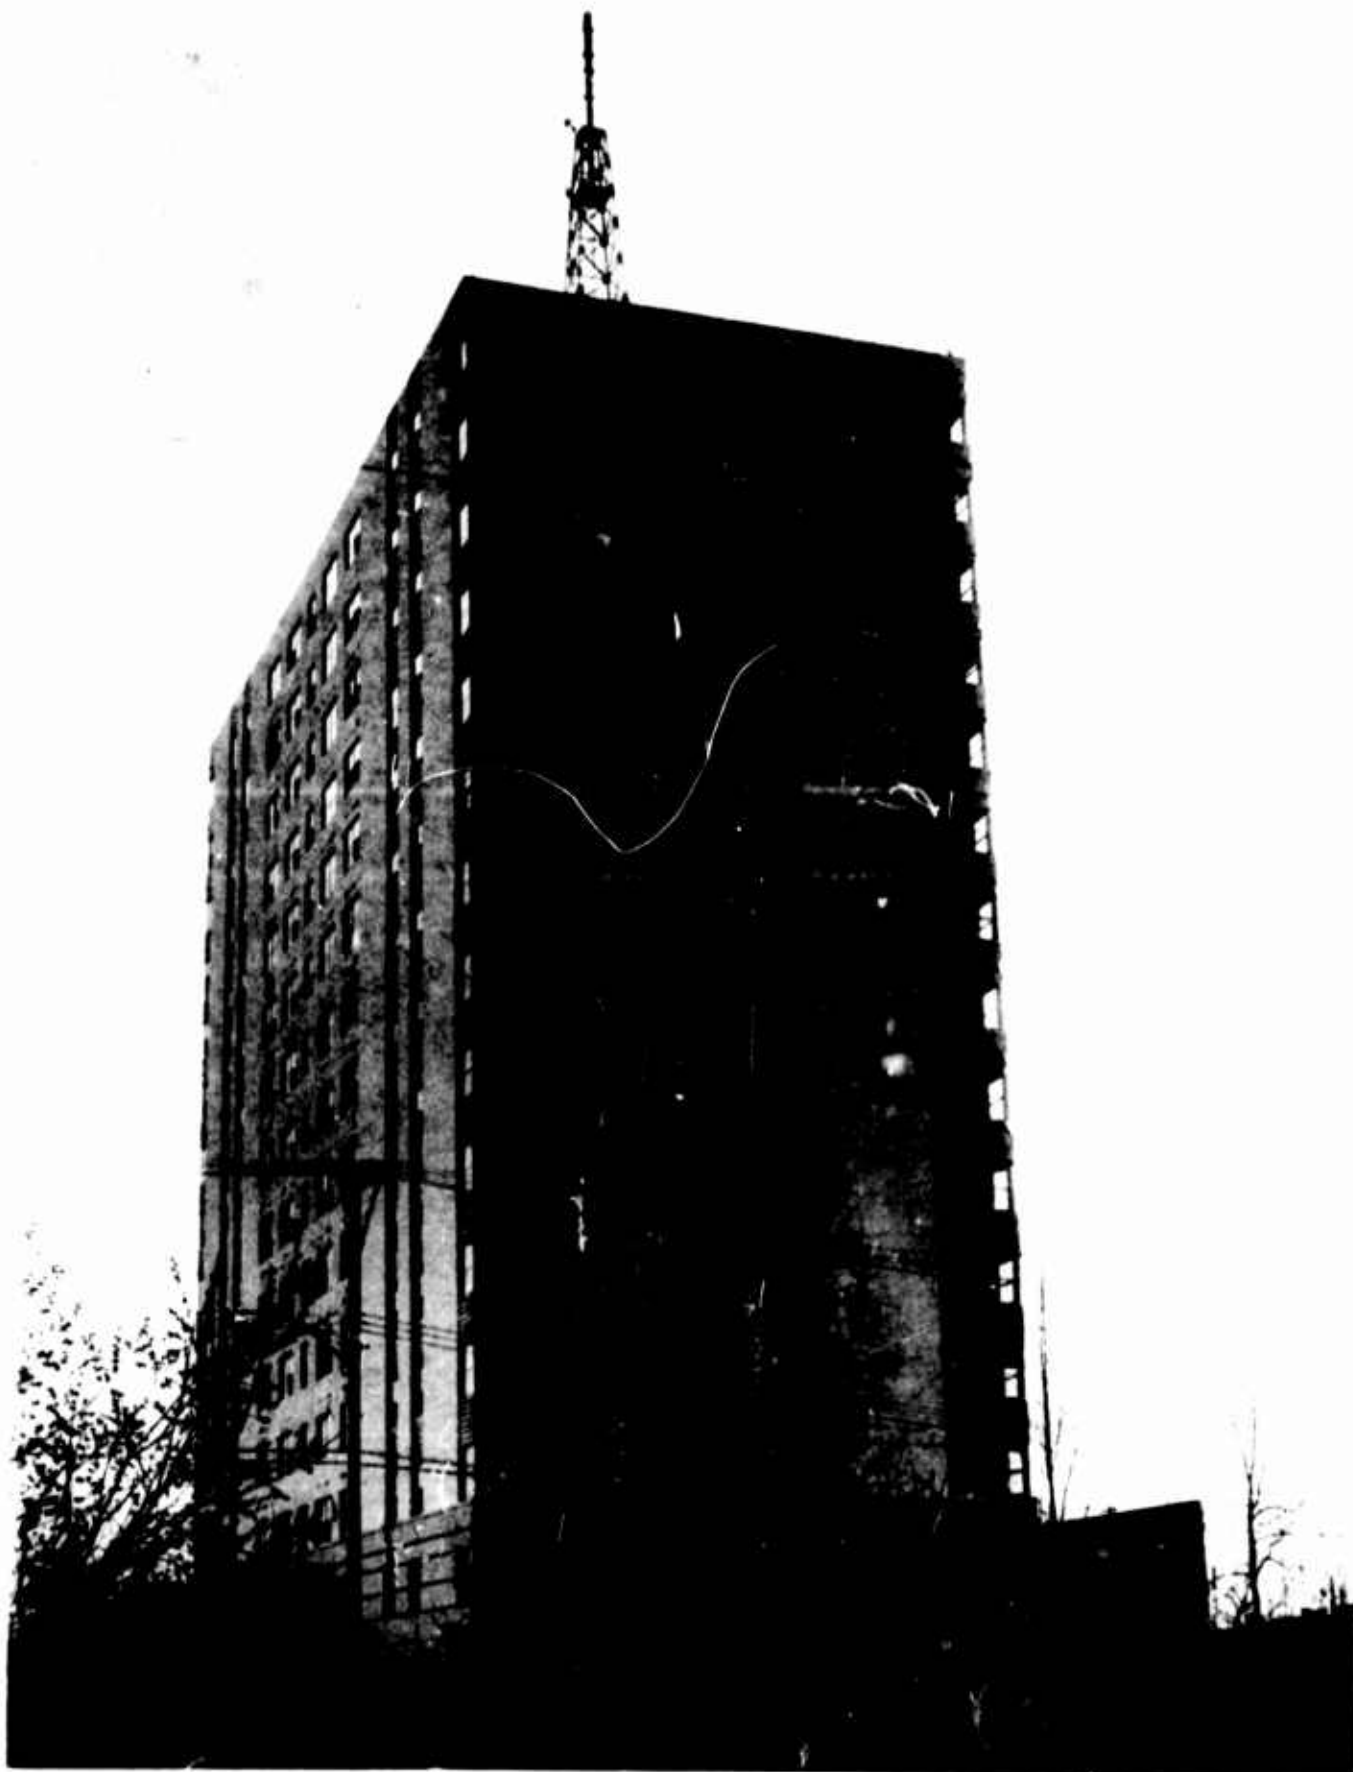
Mount McKinley Building (North side of the structure showing column wall fracture just below the fourth-floor level. TV-radio mast undamaged.)
